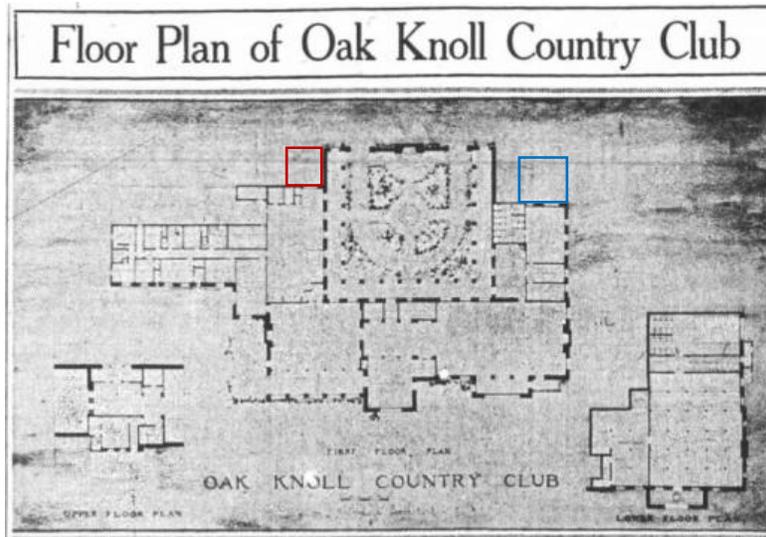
1927 Floor plan of the Oak Knoll Country Club.³ Red box identifies the northern flat roof addition and blue box identifies of southern shed roof addition (image edited by author).
